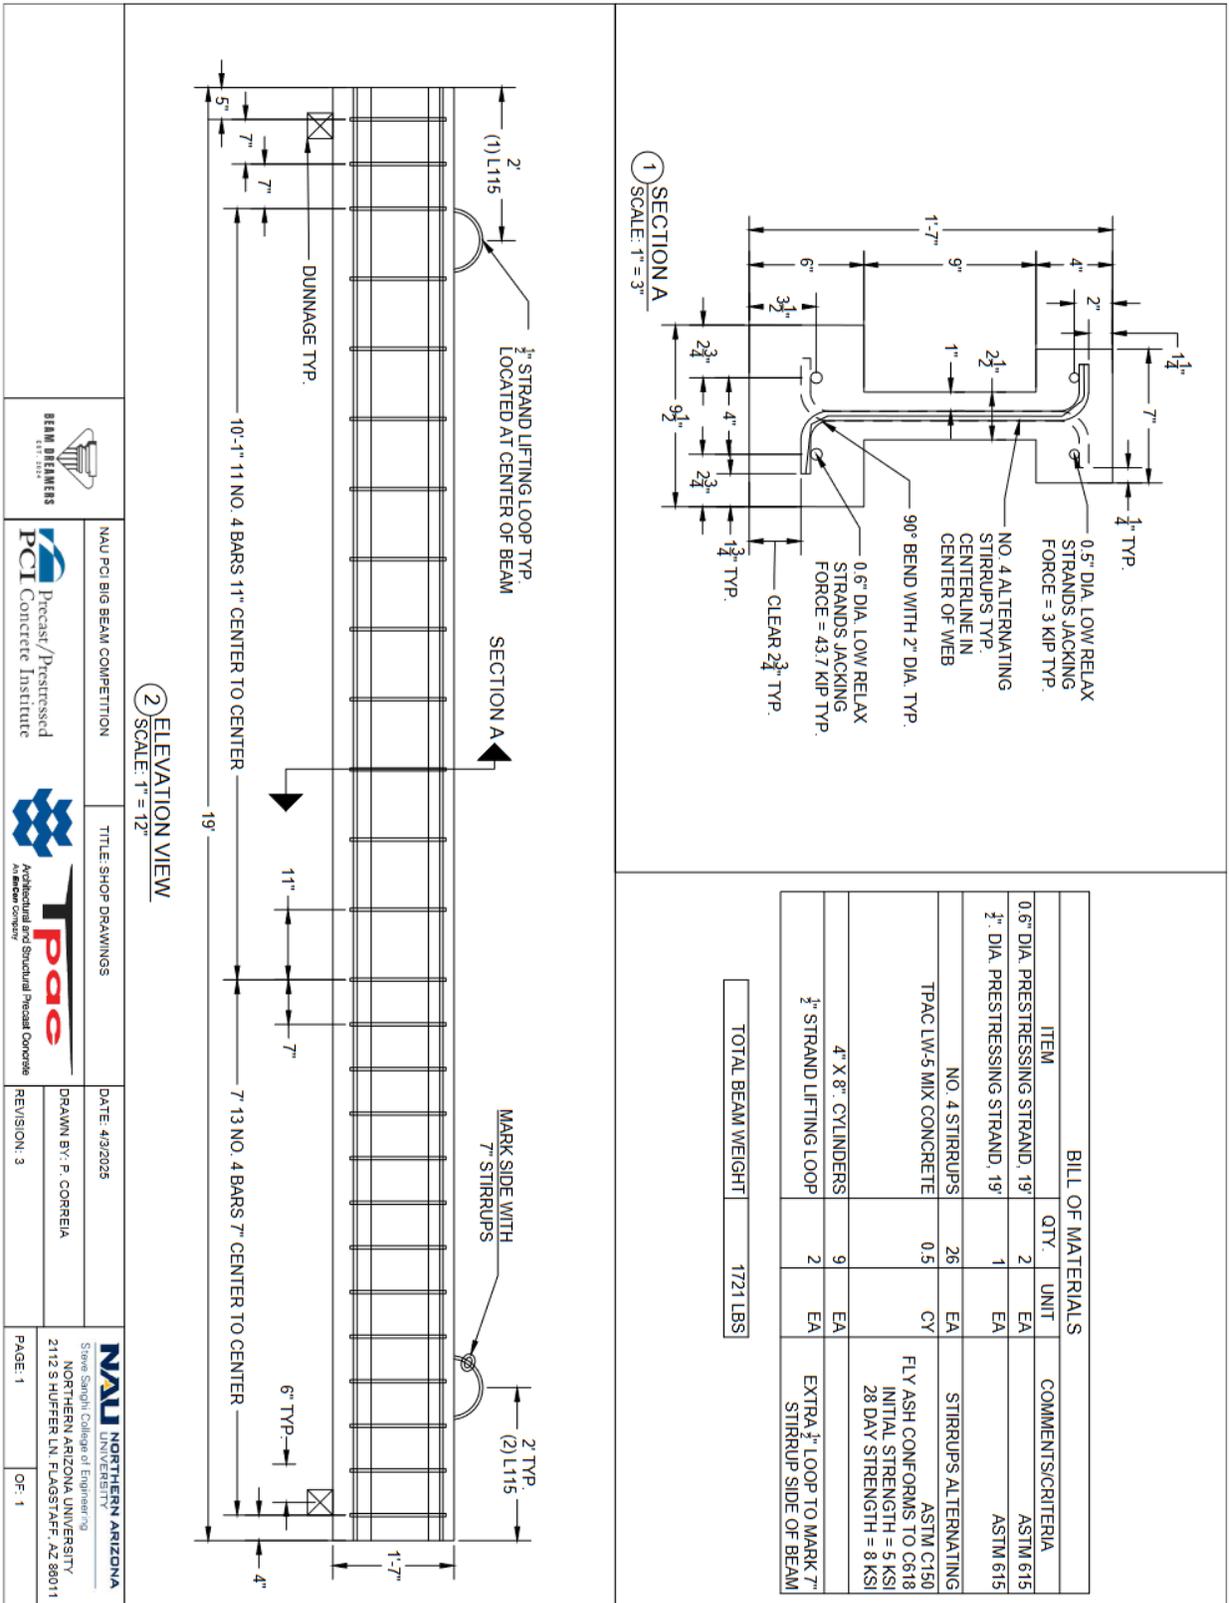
NAU Beam Shop Drawings (also located to scale in 0.1.1.1(a) Appendix H)
